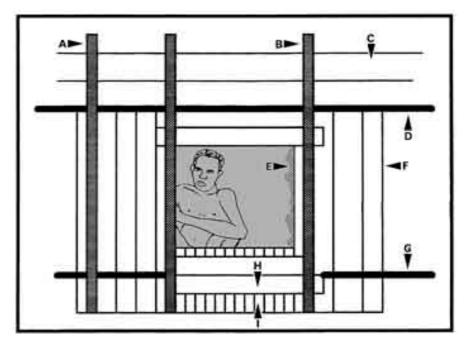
Detail of construction of the men's house at llamik (doorway). A) support post (*langwop*); B) door post (*kepukano*); C) eave lining (yebet); D) upper wall brace (*dik*); E) wall lining (*hulubit*); F) wall upright (*obahat*); G) lower wall brace (*dik*); H) door base crosspiece (*kembilik*); I) door base upright (*sila*).
